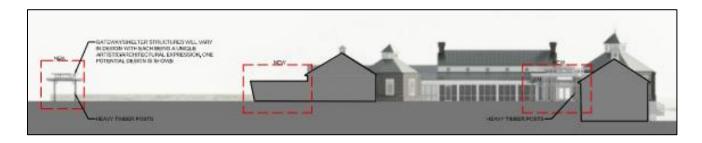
North courtyard elevation with boxes indicating new additions and changes
